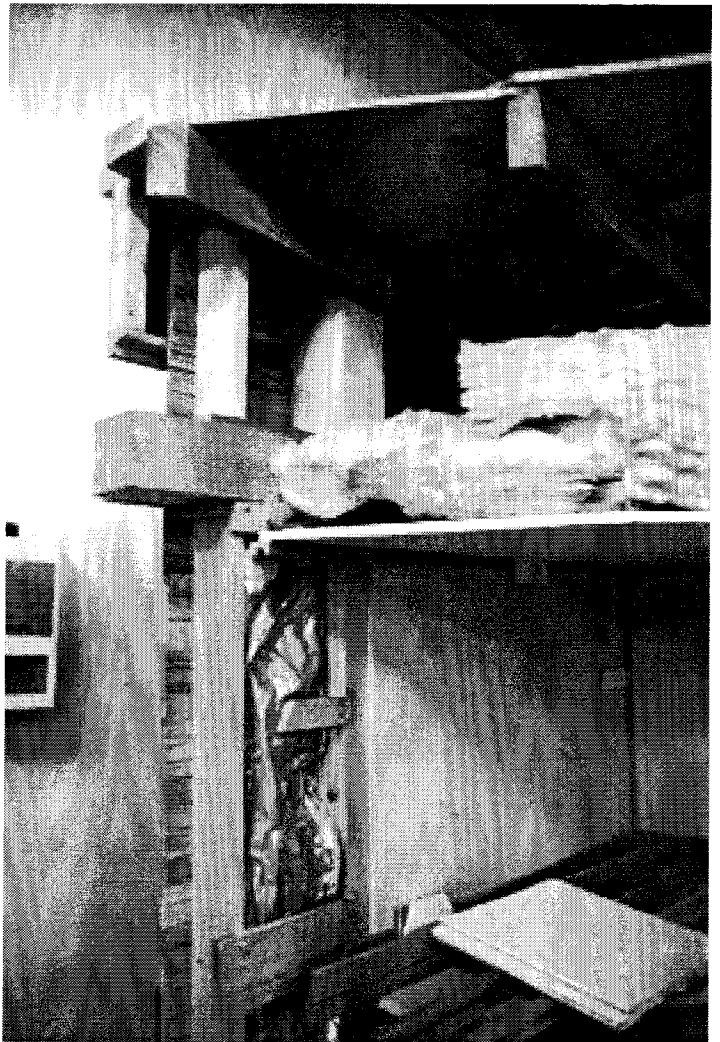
Construction mock-up Factory floor version. Wall/roof framing.
